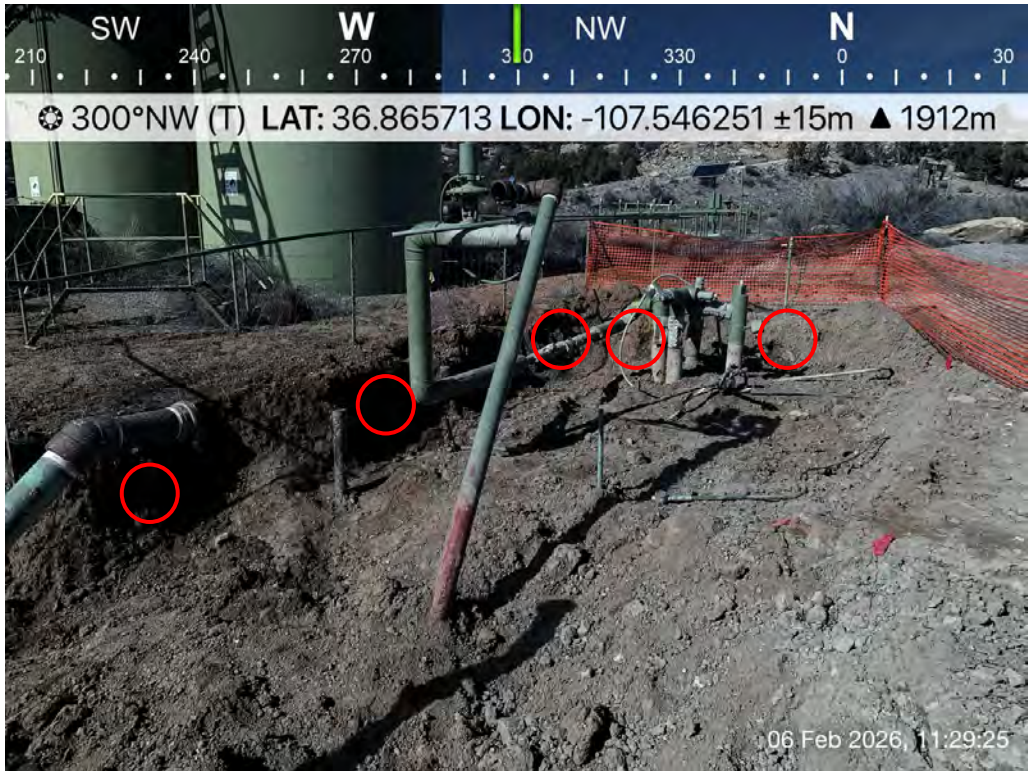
SS18 collected as a 5pct sample from the north-northwest sidewall of the POR excavation.
